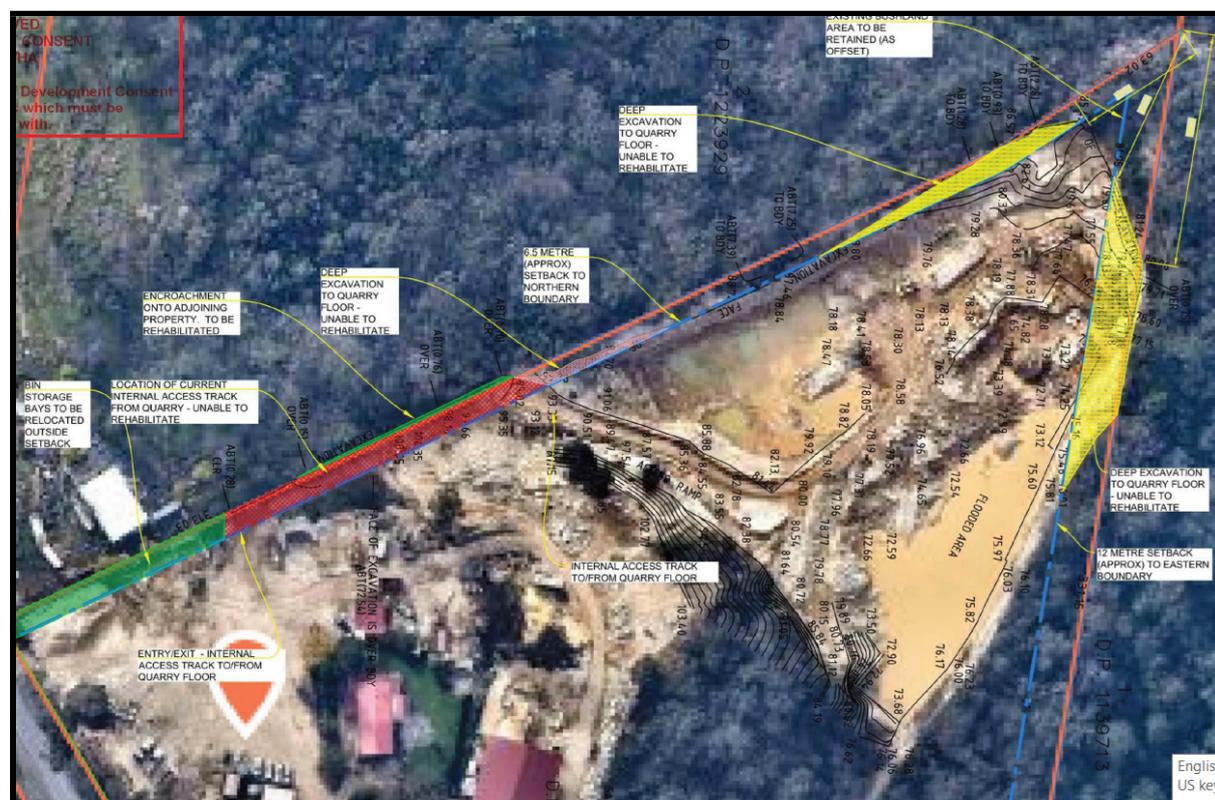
Approved Plan - DA 96/2021/HA (Source: Council files)
